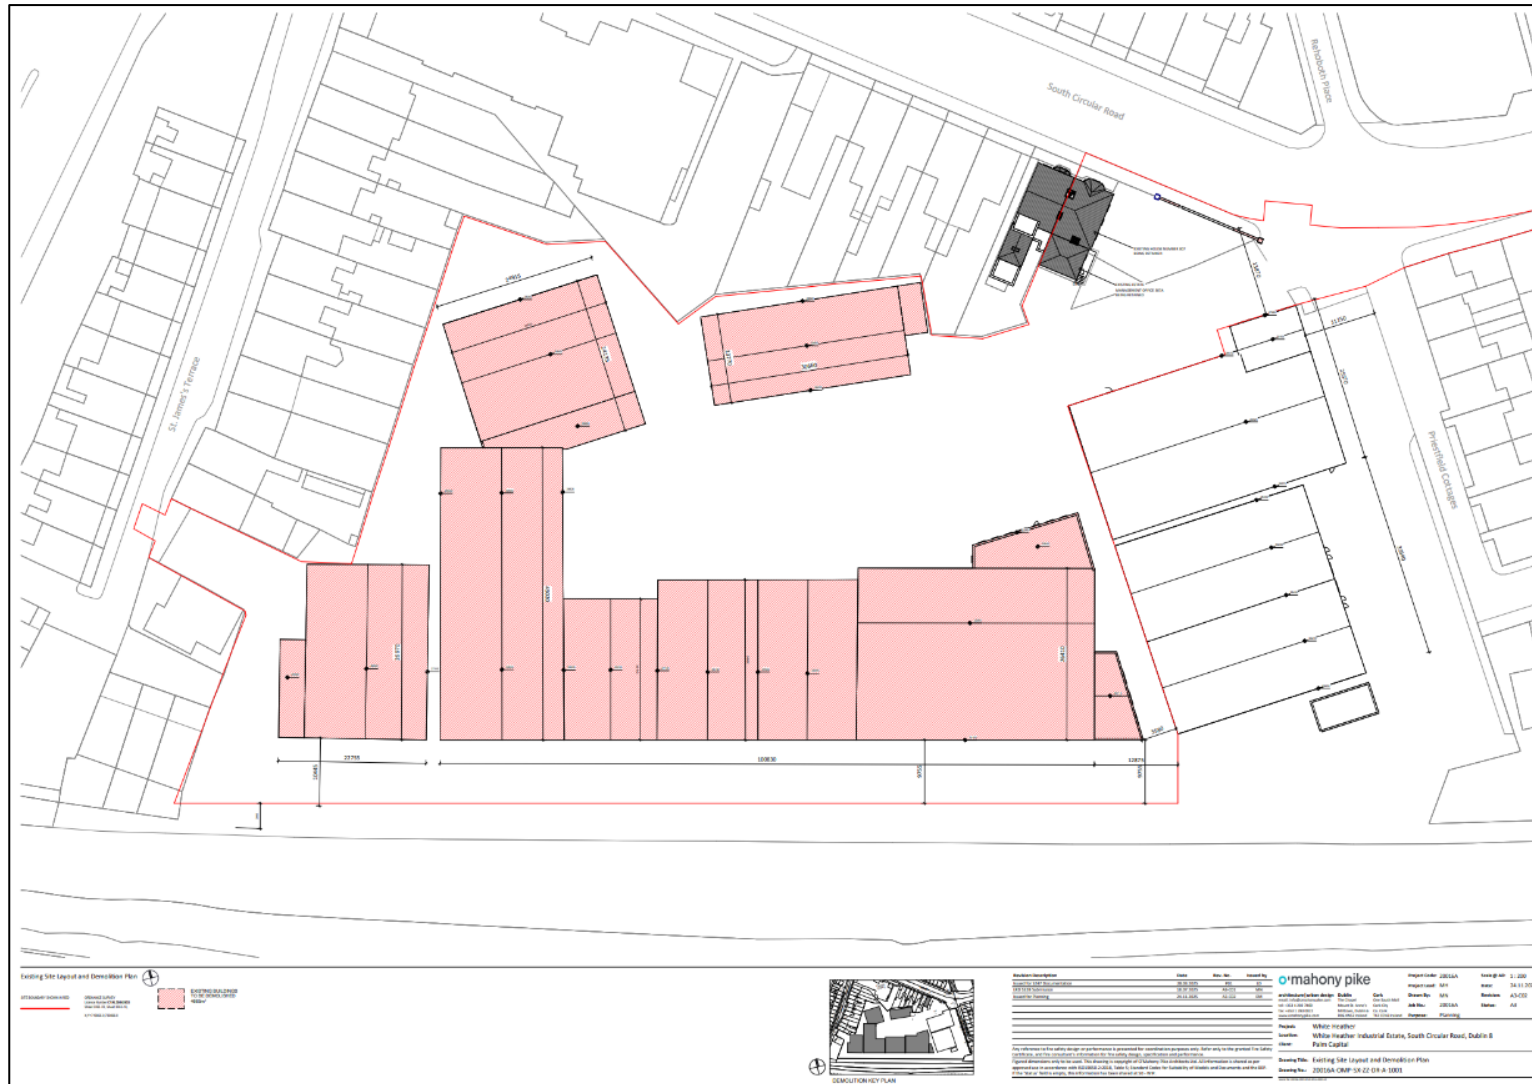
Existing Site Layout and Demolition Plan (O'Mahony Pike, 2025).
